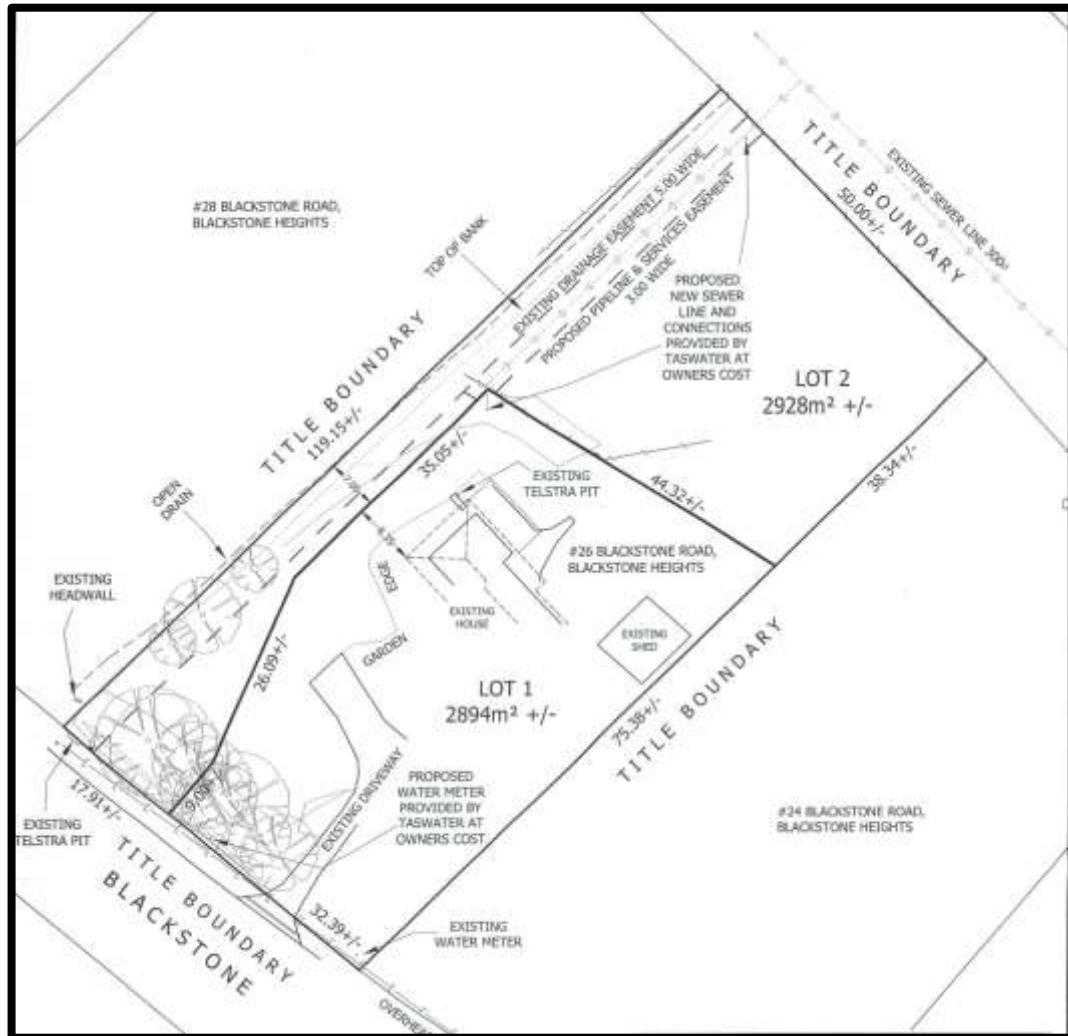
proposed subdivision layout (Source: Woolcott Surveys) – detailed plans attached
